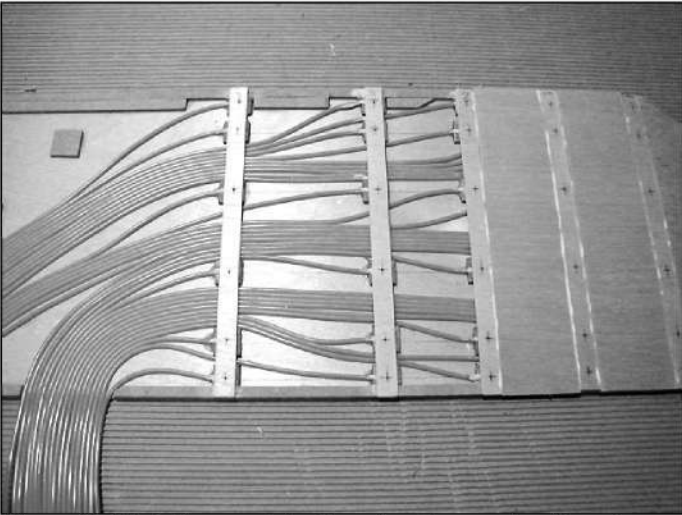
Model's grandstand roof under construction. Lower side of the grandstand's roof in process of being covered with 1.2 mm thick plywood.
